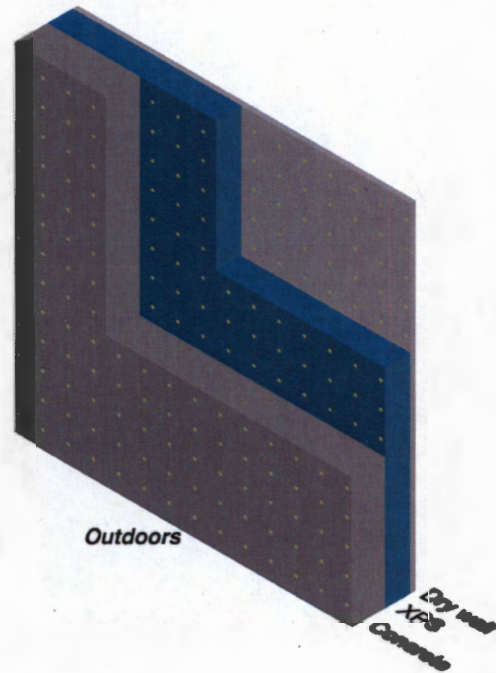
The arrangement of different layers (concrete, extruded polystyrene (XPS) insulation, drywall) in the walls of the room.
